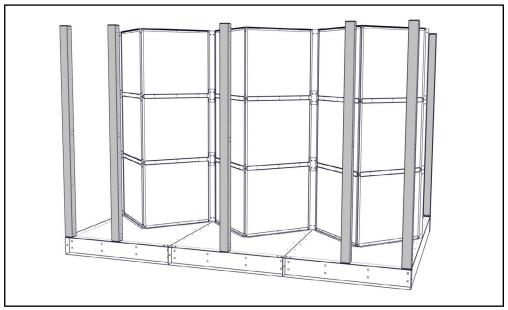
INSTALL CORE JOINING STRAPS AND CONNECTOR BRACKETS
